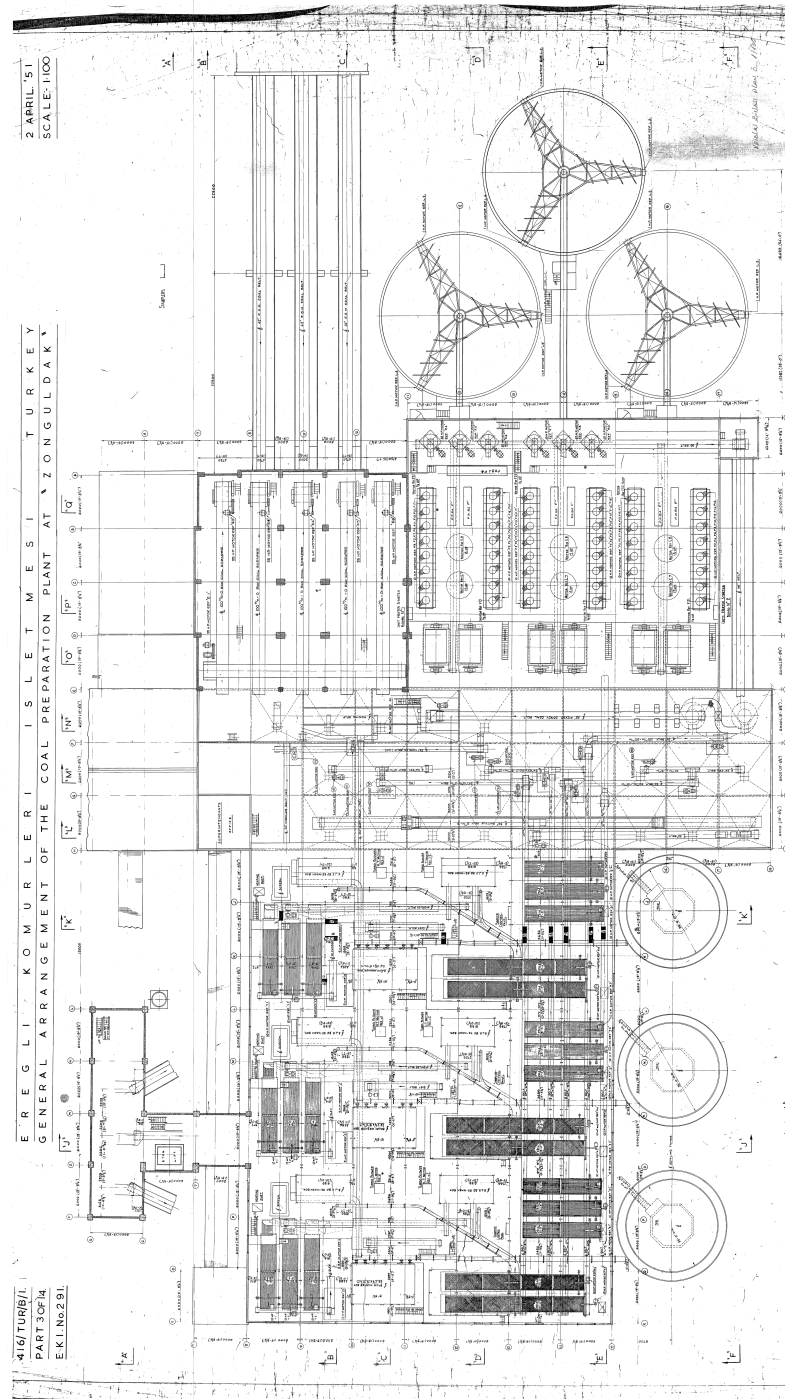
+14.00 floor plan of site 1/100 scale (TTK Archive, 2019).
